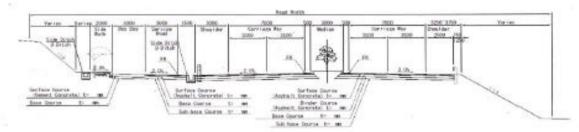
Typical Cross Section (Dhulikhel Urban Area)
